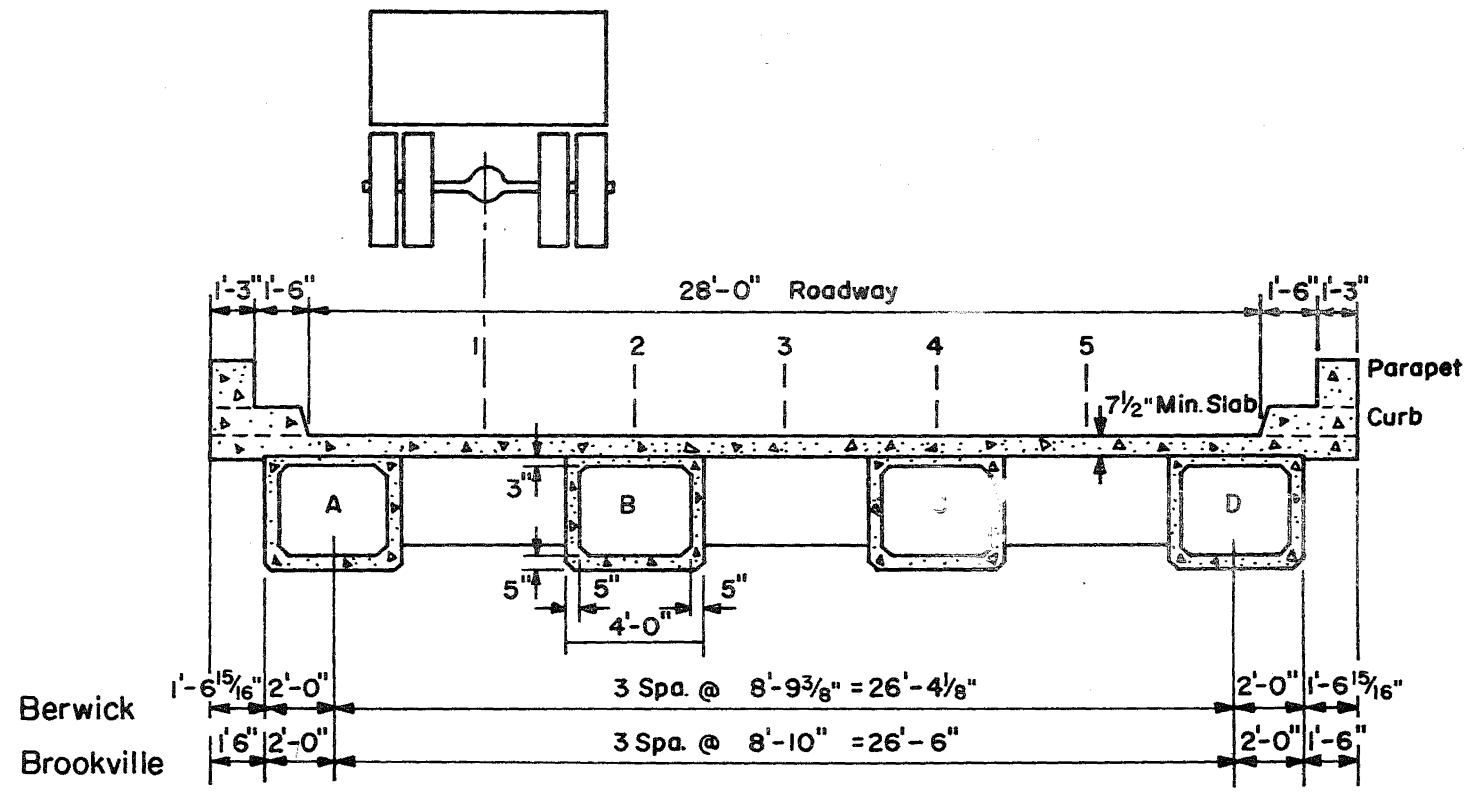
Cross Section of the Berwick and Brookville Bridge
